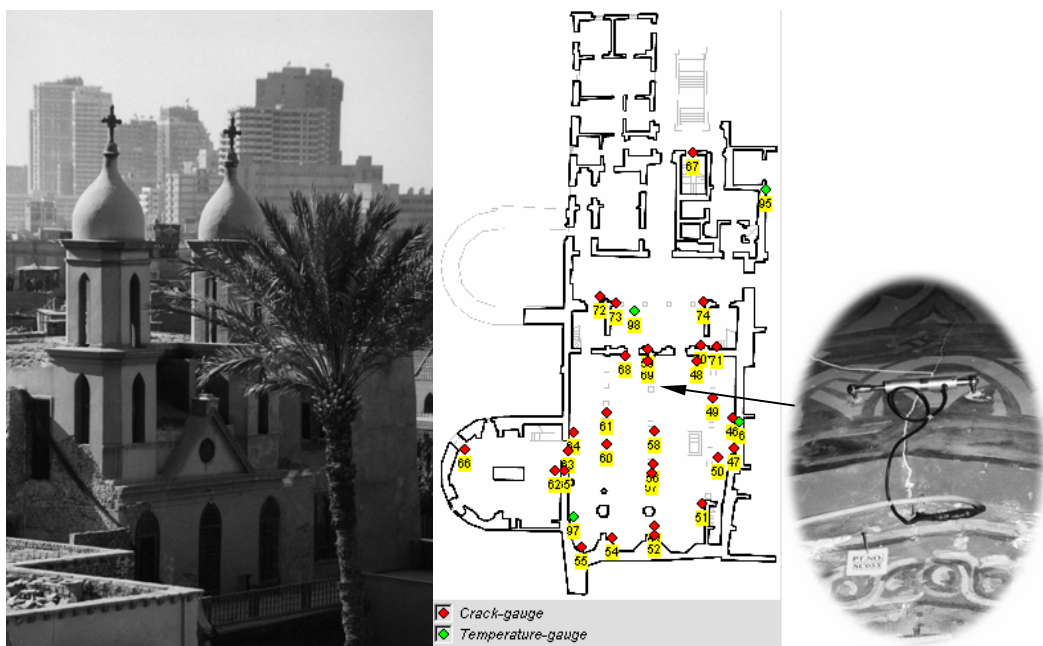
Measurements of crack movements by means of electrical crack-gauge: Monitoring System installed on the supporting structures of the Hanging Church (Cairo, Egypt) which were damaged by a recent earthquake.
